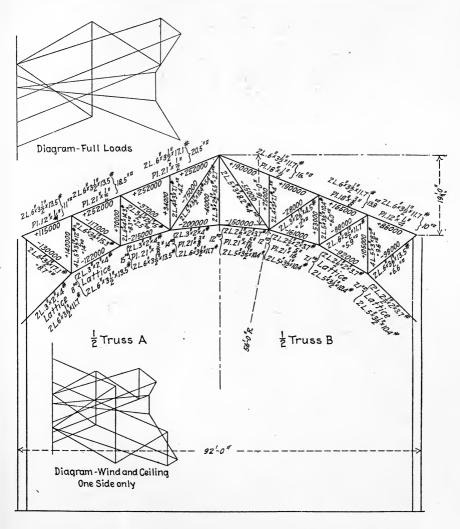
Sample roof truss with curved bottom chord. Stress sheet.
